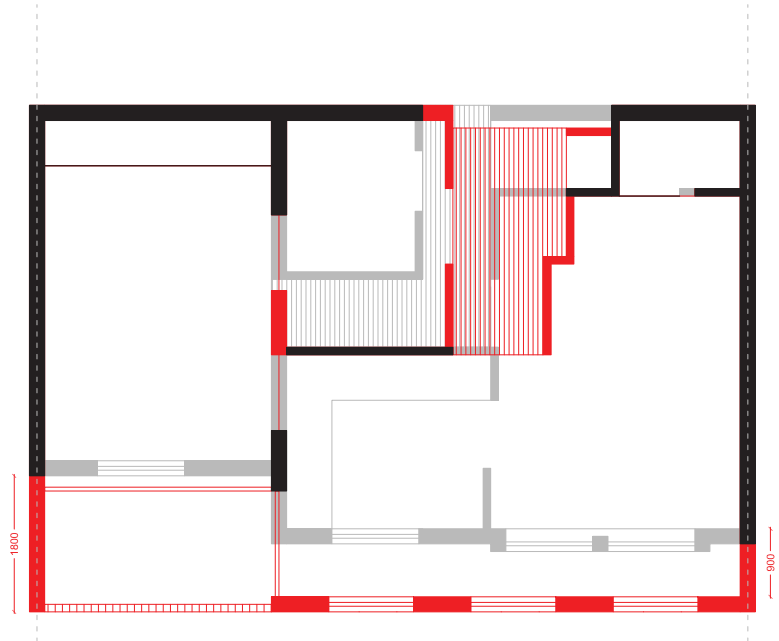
Transformation of the 1b2p-flat floor plan (scale 1:100)
